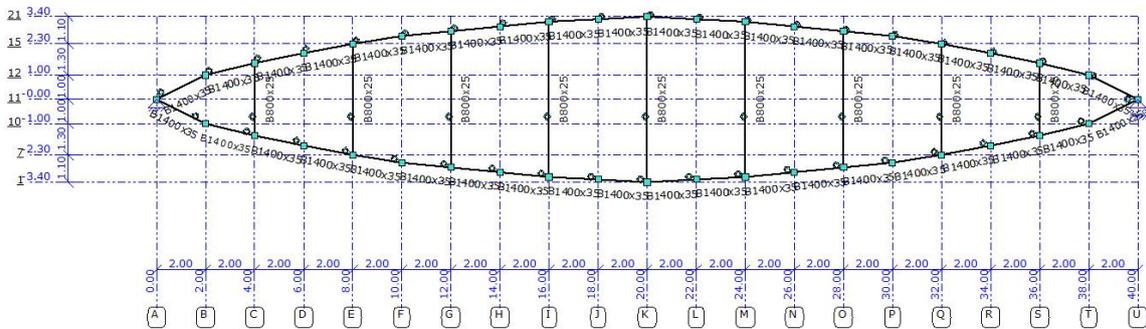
Top view of steel frame structure of the gate, showing the two arcs and nine horizontal girders.
